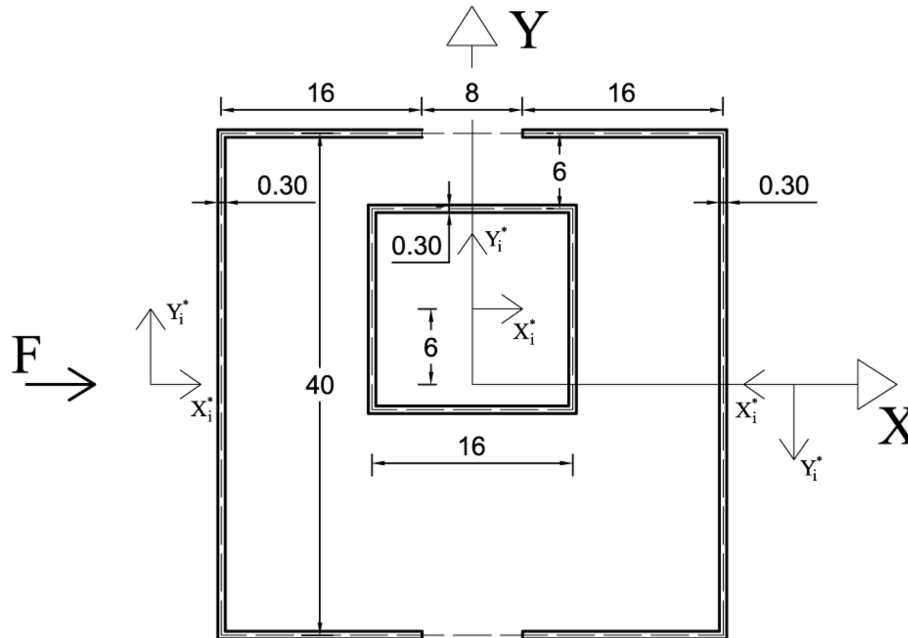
Floor plane of the example building. Tube-in-tube structure with asymmetric core
